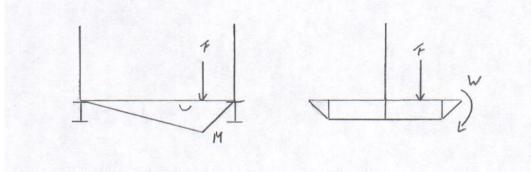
Excentric forces on a bridge deck, with two rows or one row of stay cables.
